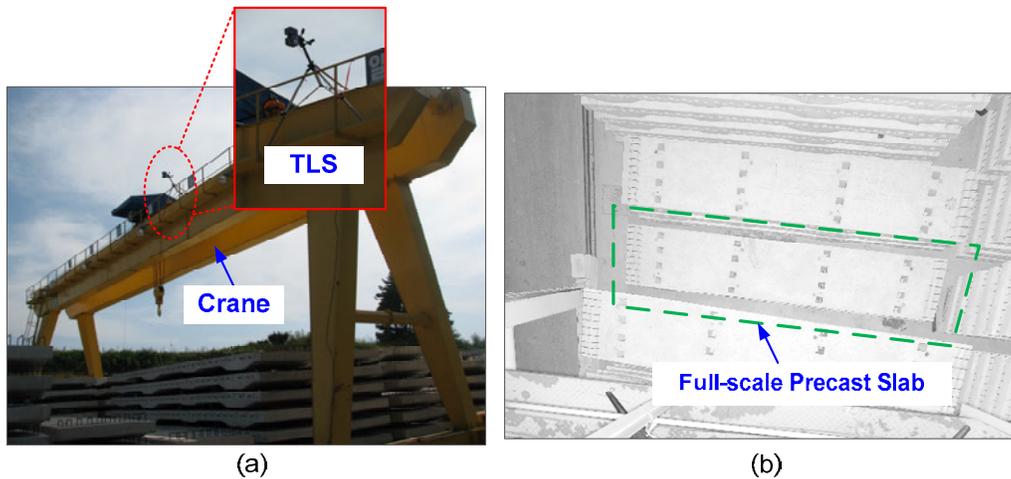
Field test configuration: (a) Test set-up; (b) Top view of the inspected precast slab
